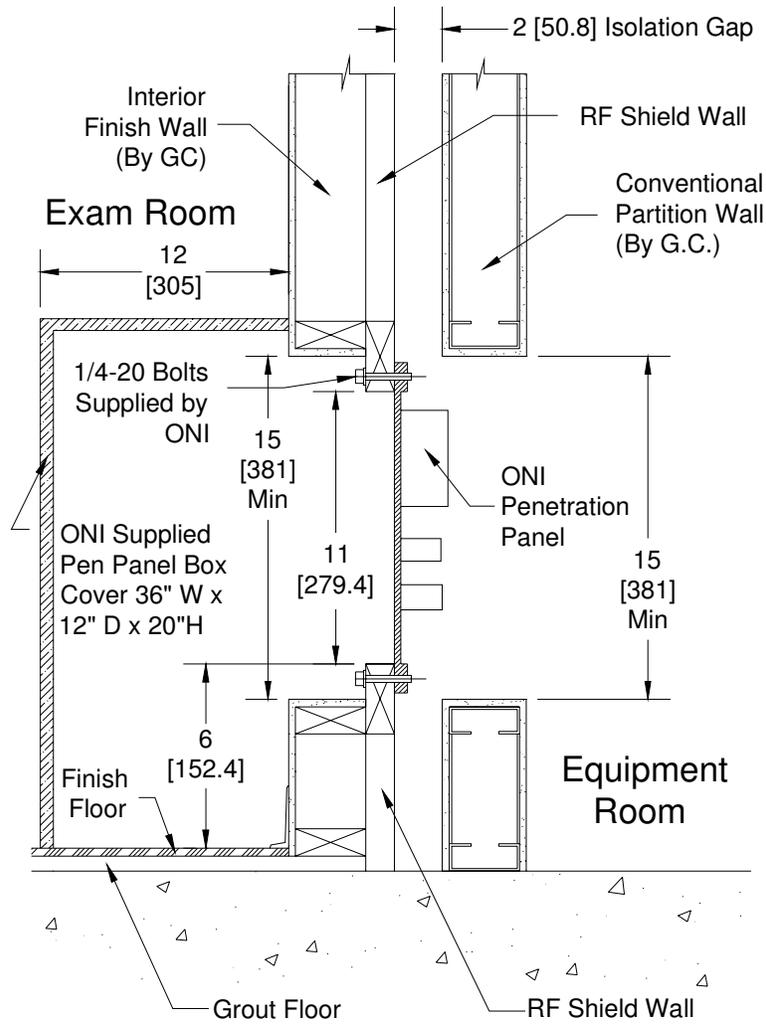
Pen Panel wall section. Typical shown. Shield wall/floor detail may vary with RF subcontractor.
